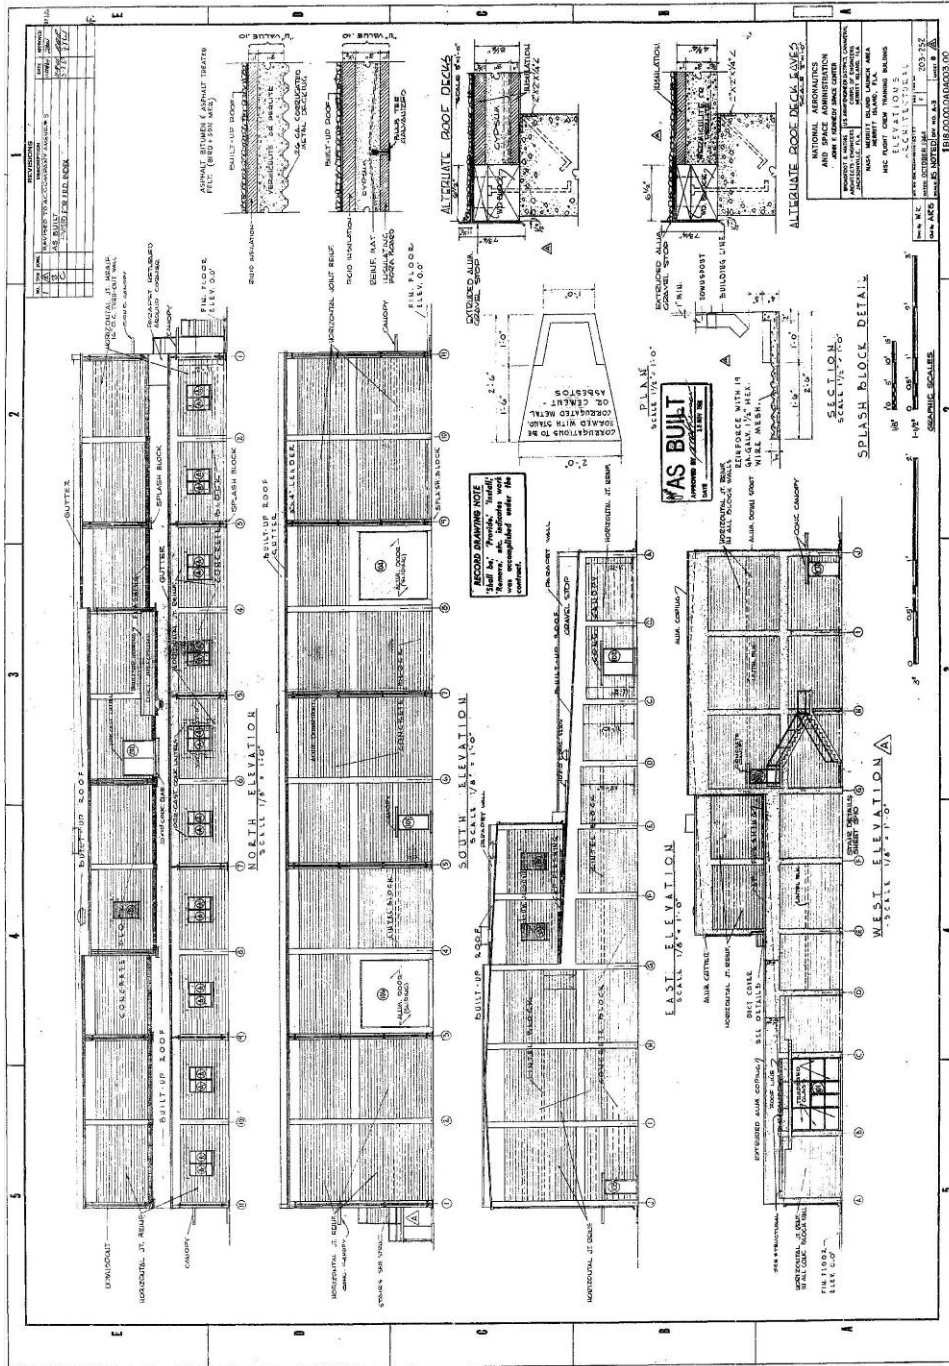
Broadfoot & Mathis, Flight Crew Training Building, Elevations, October 1964, Sheet 8.
